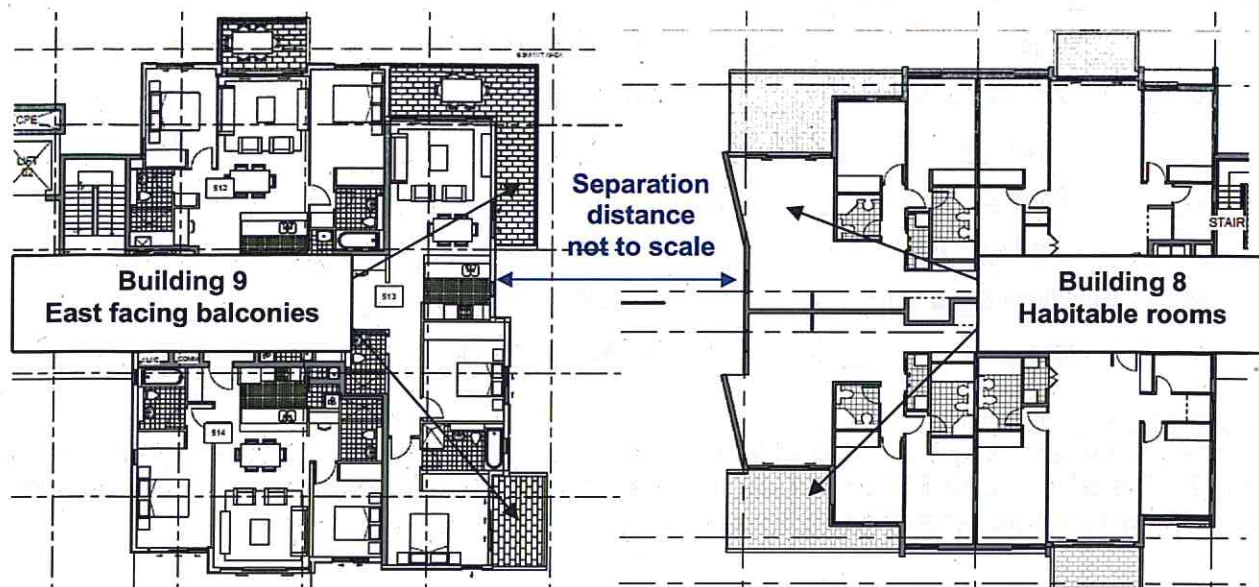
Typical floor layouts for Building 9 and Building 8 at four storey level
